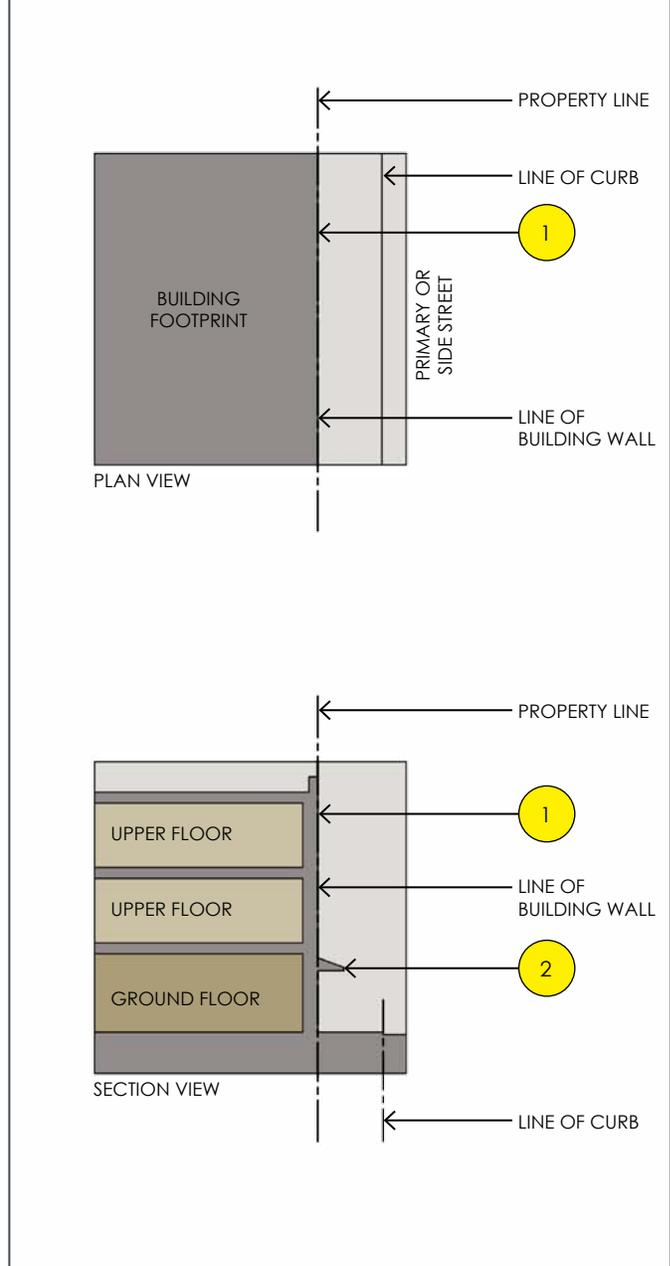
MIXED-USE BUILDING WITH STOREFRONT FRONTAGE
